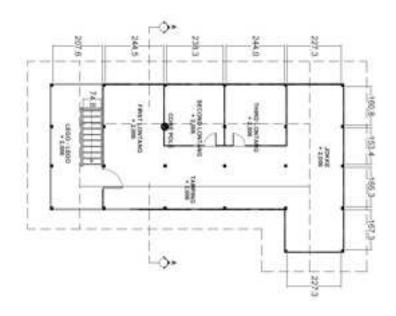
Z1-JS-25: Floorplan. Source: Field survey 2015
